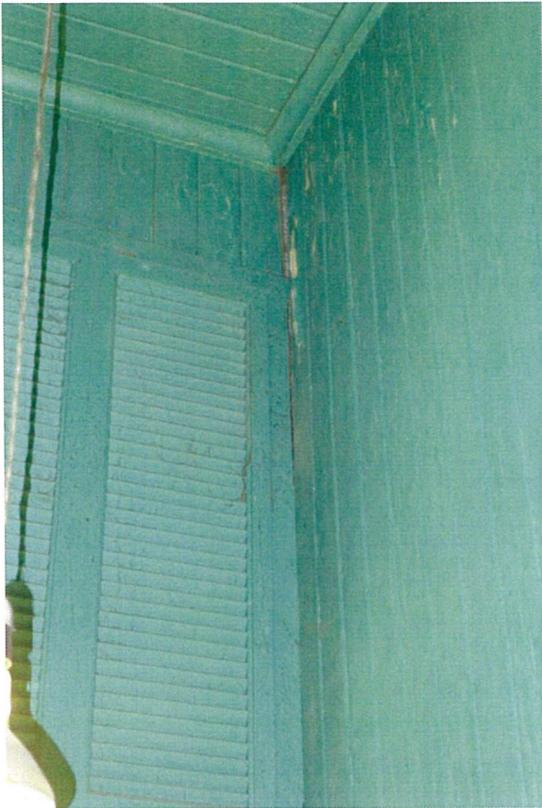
Minor cracks in the bathroom, most likely a result of water damage.
